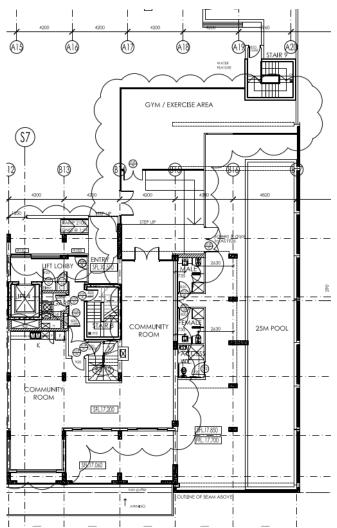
Swimming pool and gym facilities at 8 Bourke Street development
